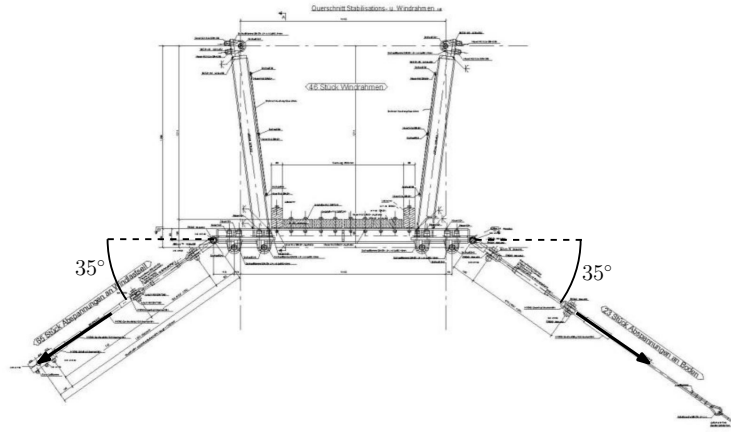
Construction plan of one section of the Geierlay footbridge (adapted from [48])
